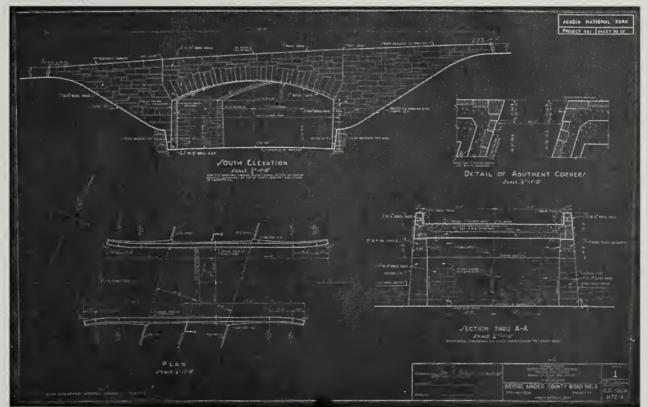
Drawing of the Blackwoods Bridge on Day Mountain Road, designed and built by the BPR from 1939-1941. The bridge is also called the "Floating Bridge" because of its unique timber pilings. (U.S. Department of Agriculture, Bureau of Public Roads, Project 9A1, Sheet 30 of x, June 1939)
